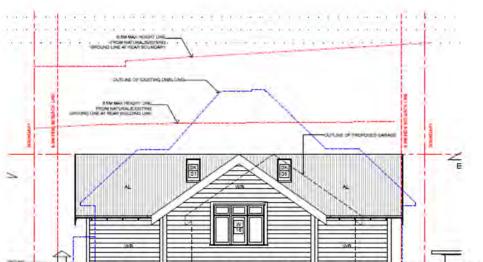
Comparison between south elevation of existing and proposed (Section of scaled South Elevation Plan provided by applicant).
